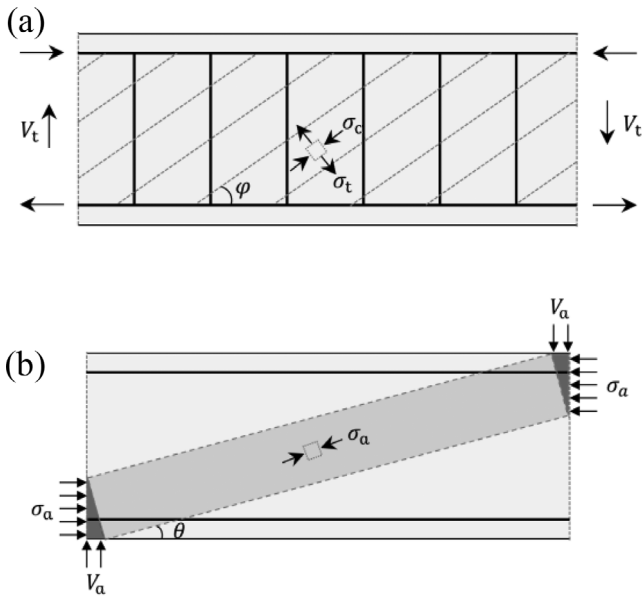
Two basic load transfer mechanism: (a) truss action; (b) strut action or arch action
